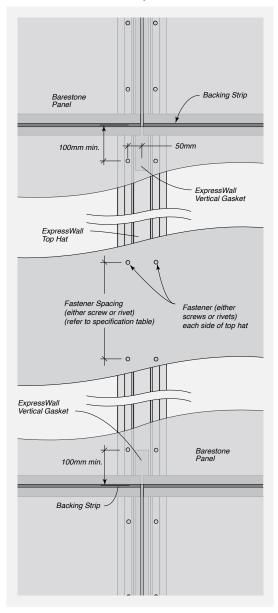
Vertical Joint Detail - Rivet Fixed
